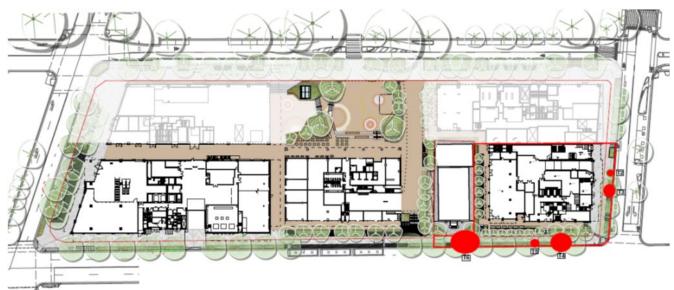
Site Plan showing the five subject trees in red Source: Aspect Studio
